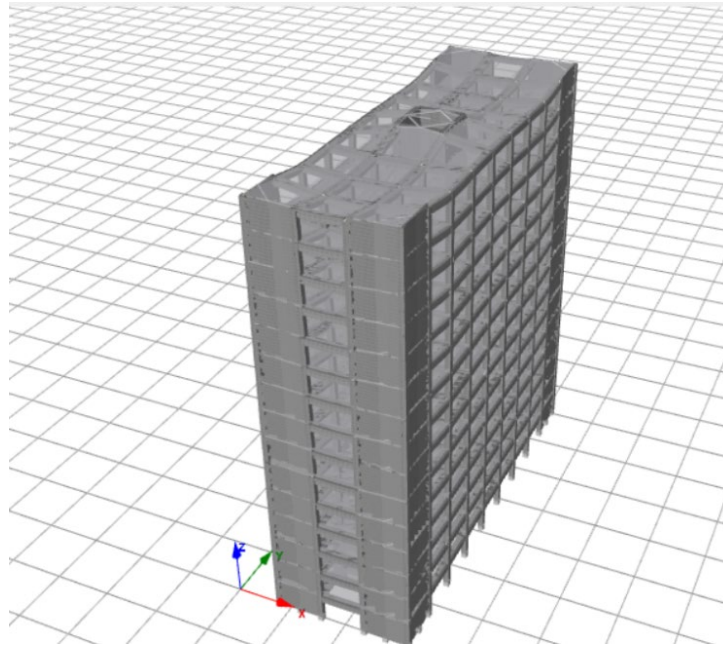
Deformed Shape of the Structure with a Geometrically Irregular Plan
